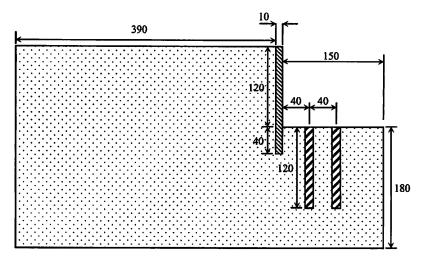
Schematic section through the centrifuge model showing one possible arrangement of piles
